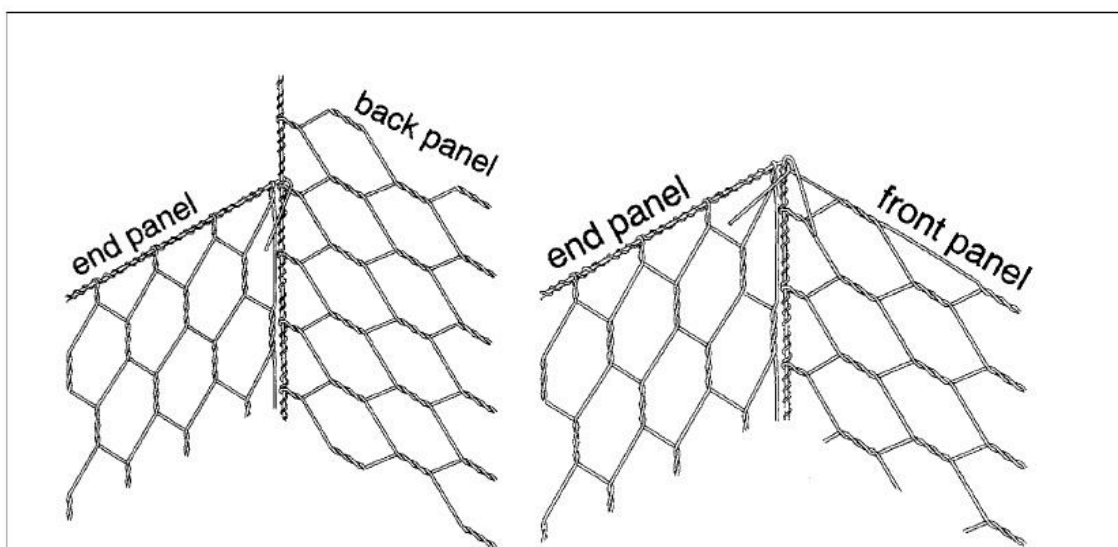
Assembly—Gablons—Selvedge Connection End and Front Panel to Back Panel
